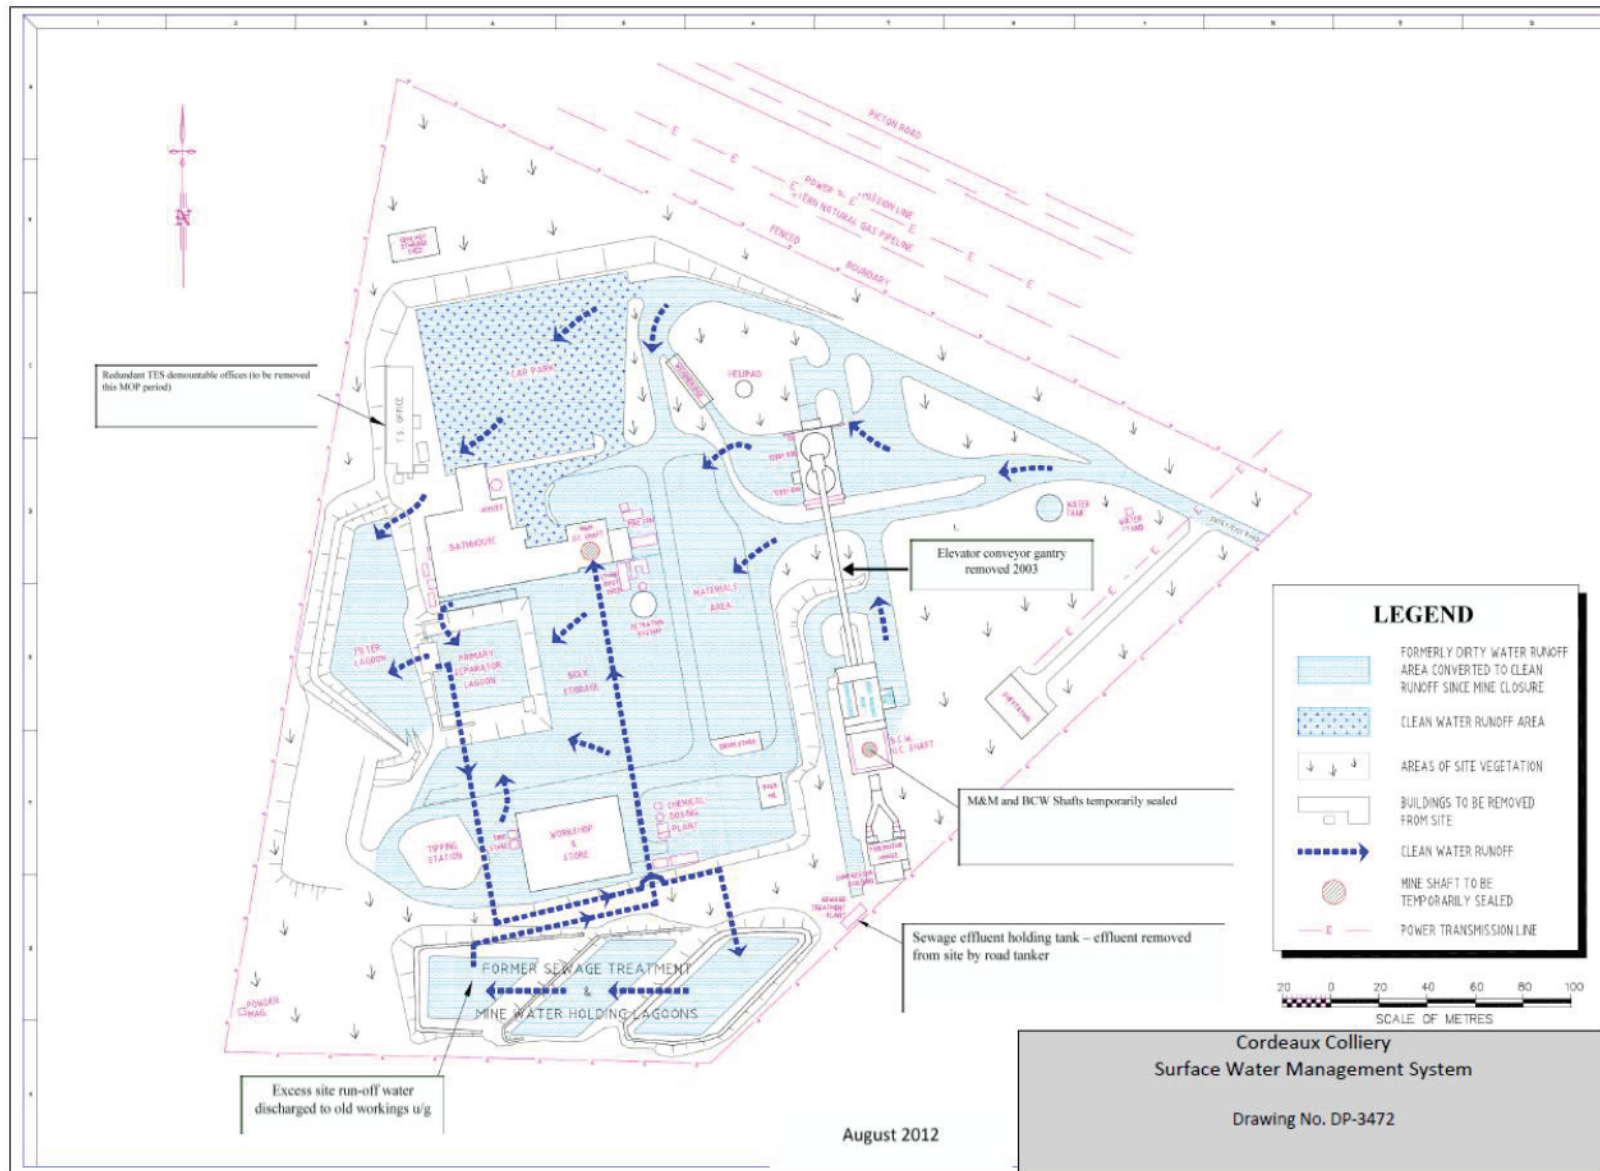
Cordeaux Pit Top Surface Water Management System (Source: South32, 2017)
